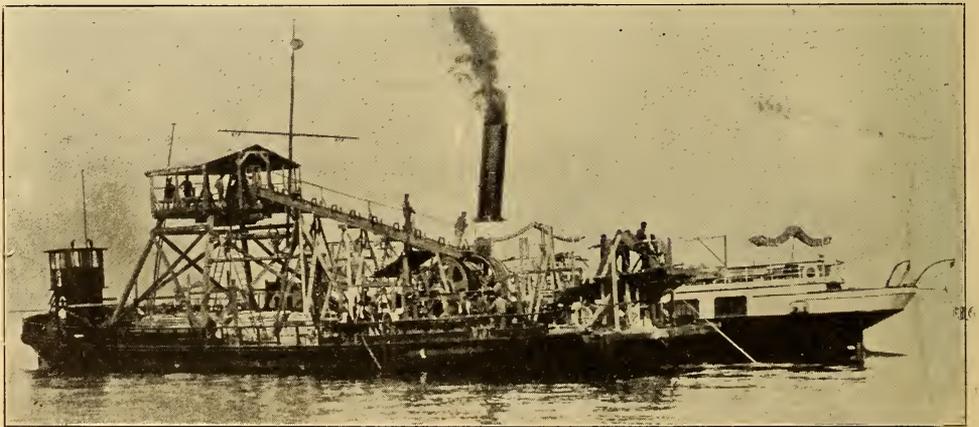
SPECIAL CABLE LAYING MACHINE.
